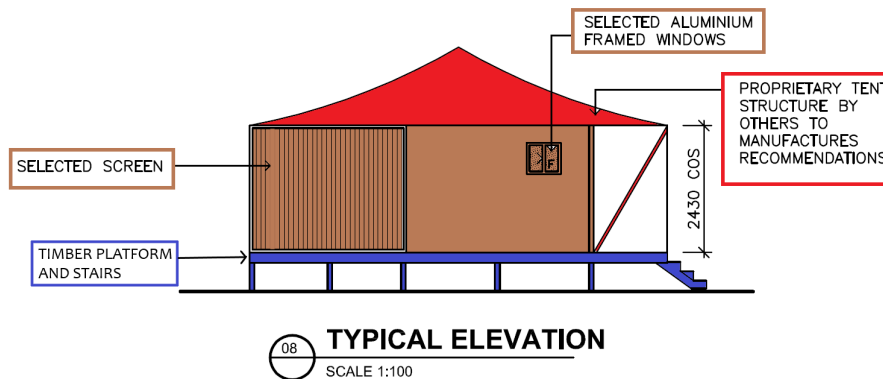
Marked up elevation plan of proposed platforms and ensuite
